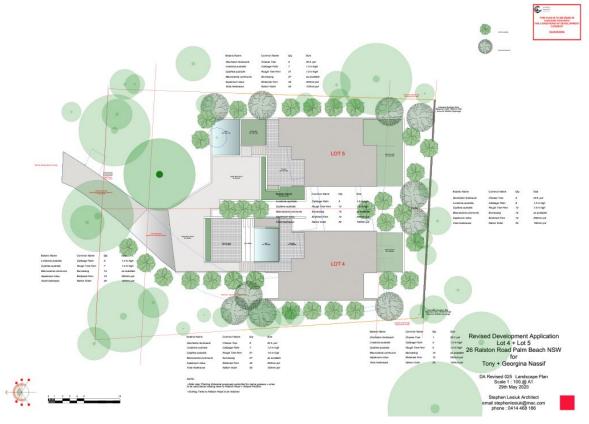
Approved Landscape Plan by Stephen Lesiuk Architect Source: Northern Beaches Council
